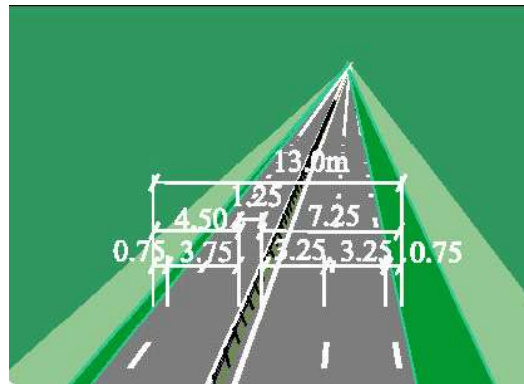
Cross-section of existing 13 m 2+1 road [8].
